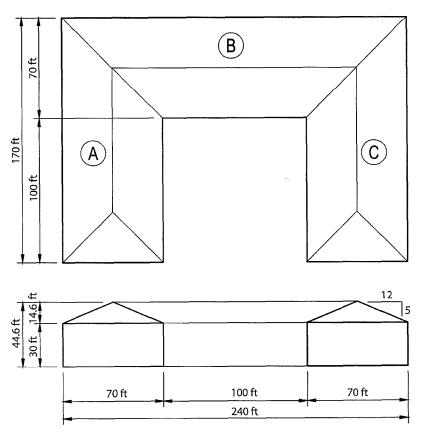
240-ft × 170-ft U-shaped Apartment Building
